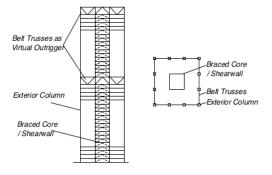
Tipical Belt Truss Location in a Highrise Building [1]
